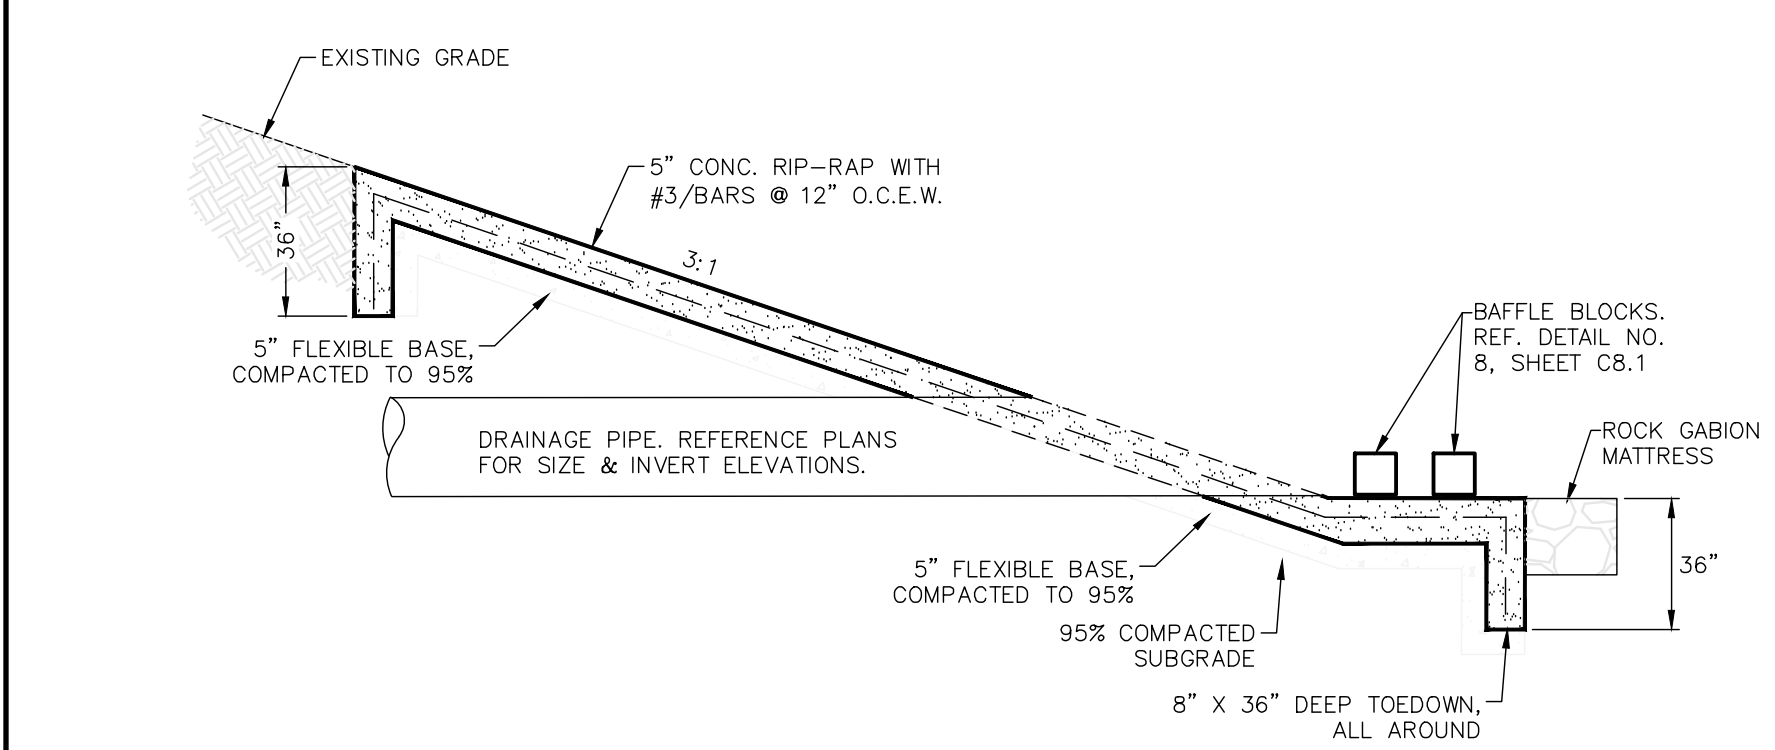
DETAIL 'B': ENERGY DISSIPATOR REINFORCEMENT DETAIL (N.T.S.)
